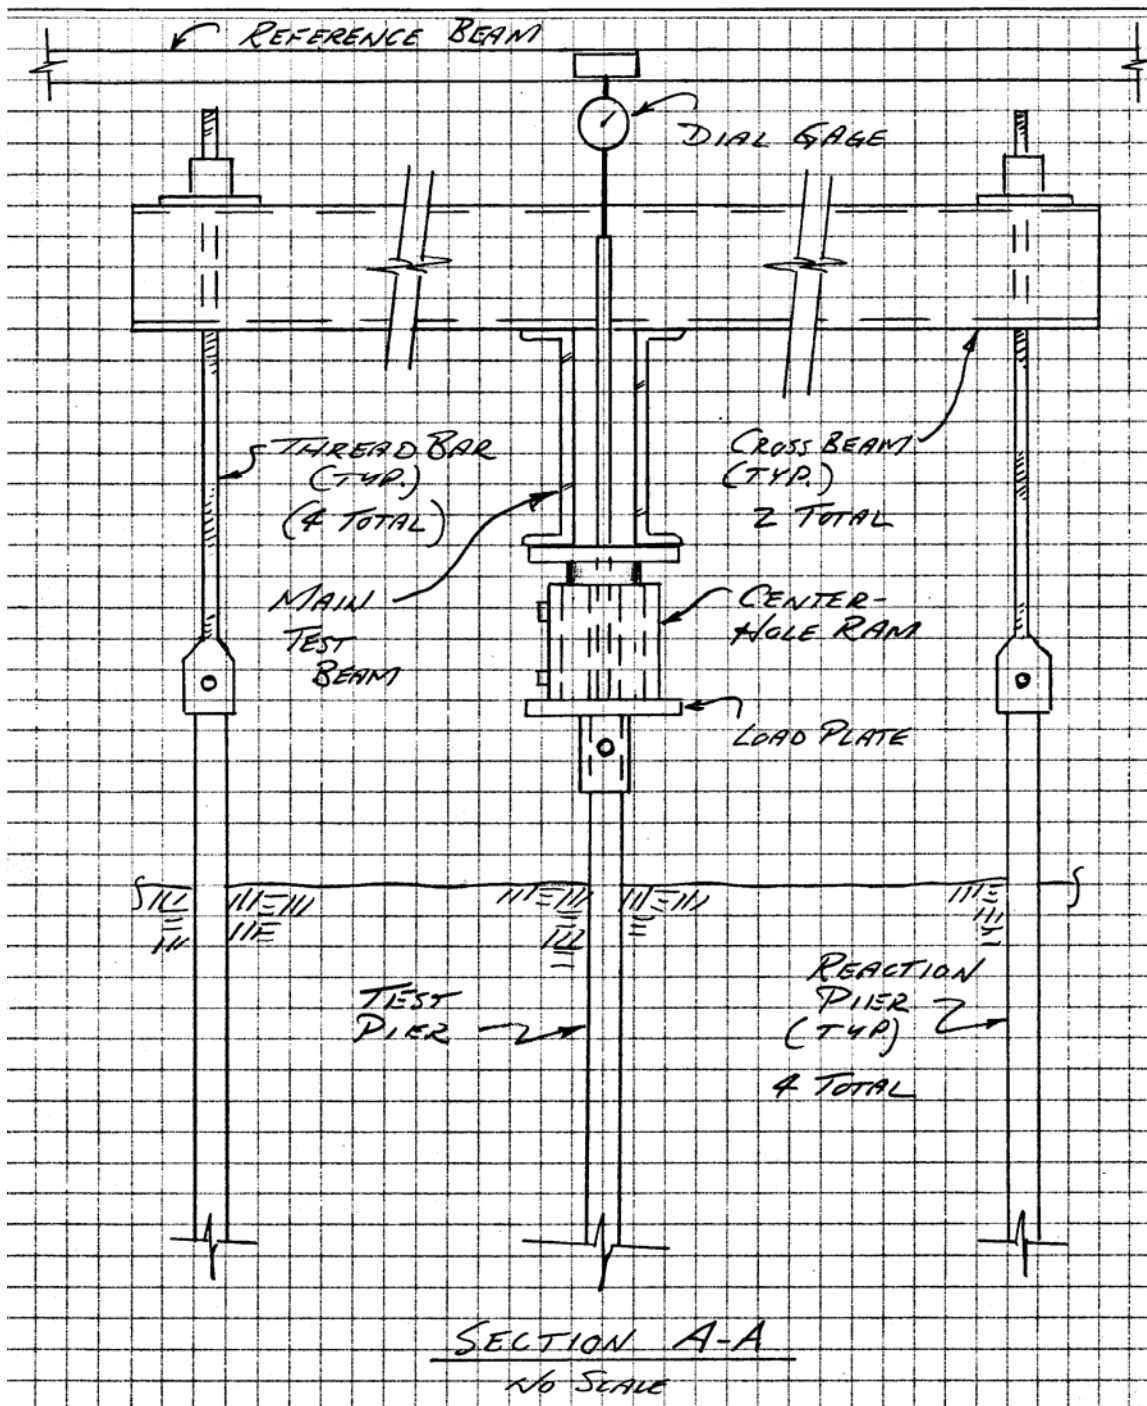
(b). Cross-section View of Compression Load Test Equipment
